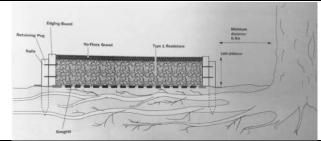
Image C: An image from 'Tree Roots in the Built Environment' 10, showing how to construct surfacing (similar to decomposed granite) above a trees root system without excavation. Type 1 Roadstones are an example of blue metal or crushed sandstone.
